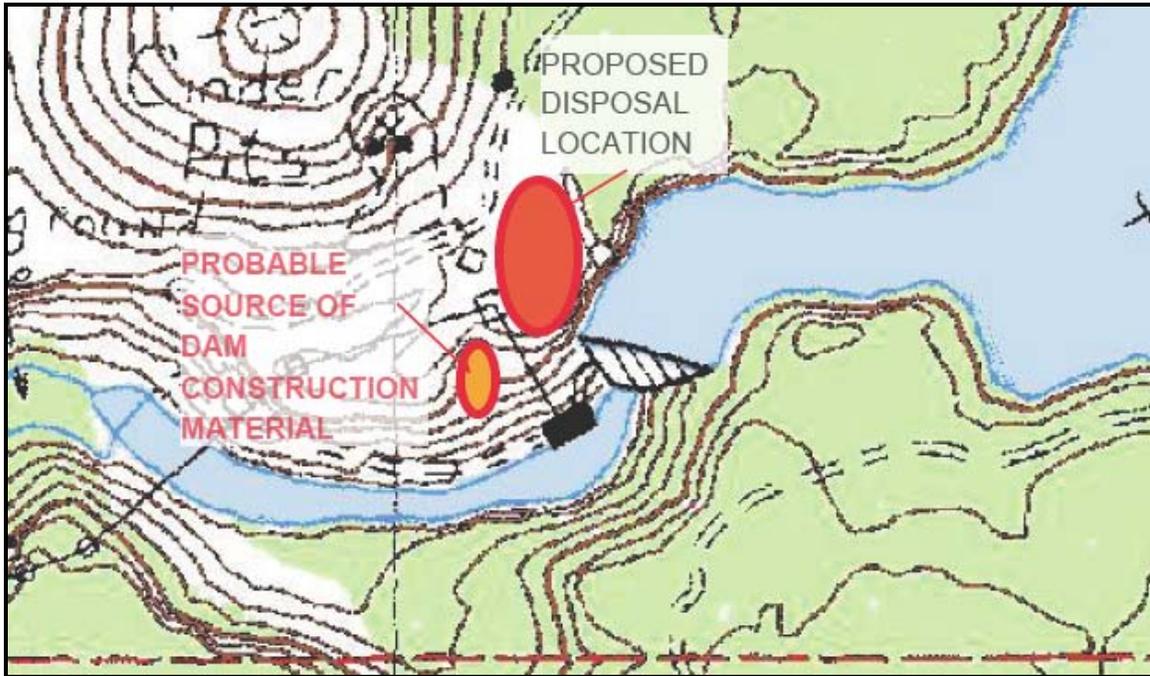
Plan View of Copco 1 Dam and Proposed Spoils Site
